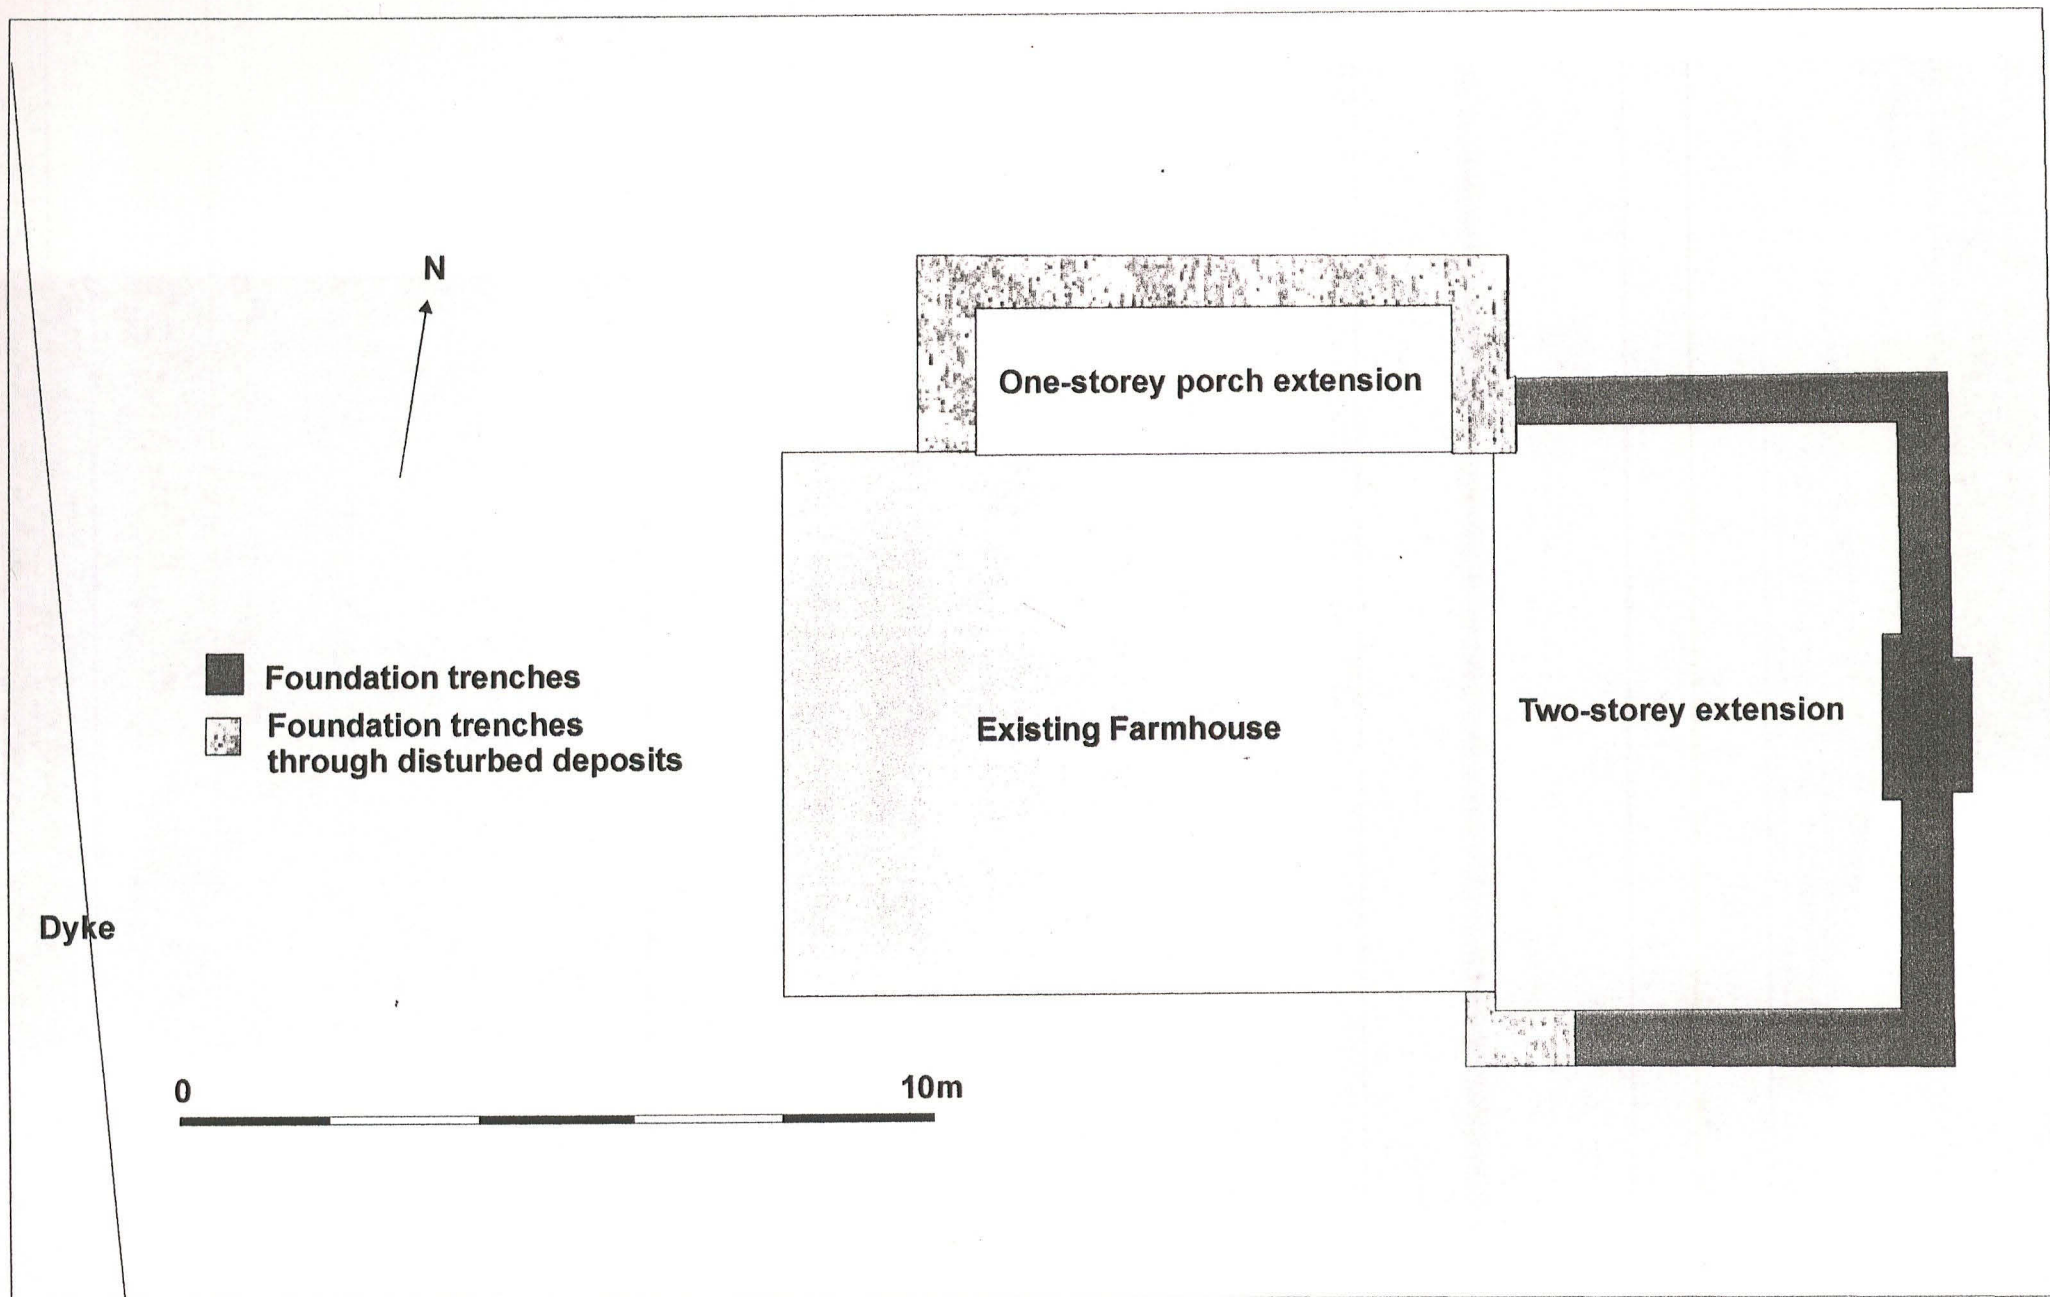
Plan of foundation trenches, based on a plan provided by the client
